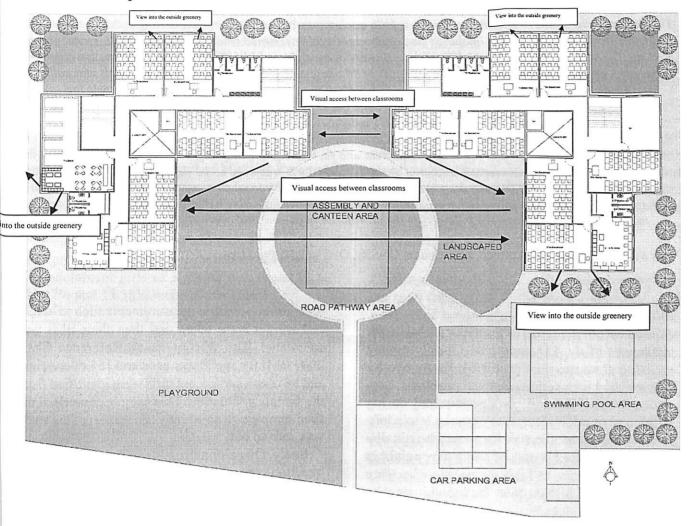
Site plan showing ground floor of school buildings/swimming pool and landscape
